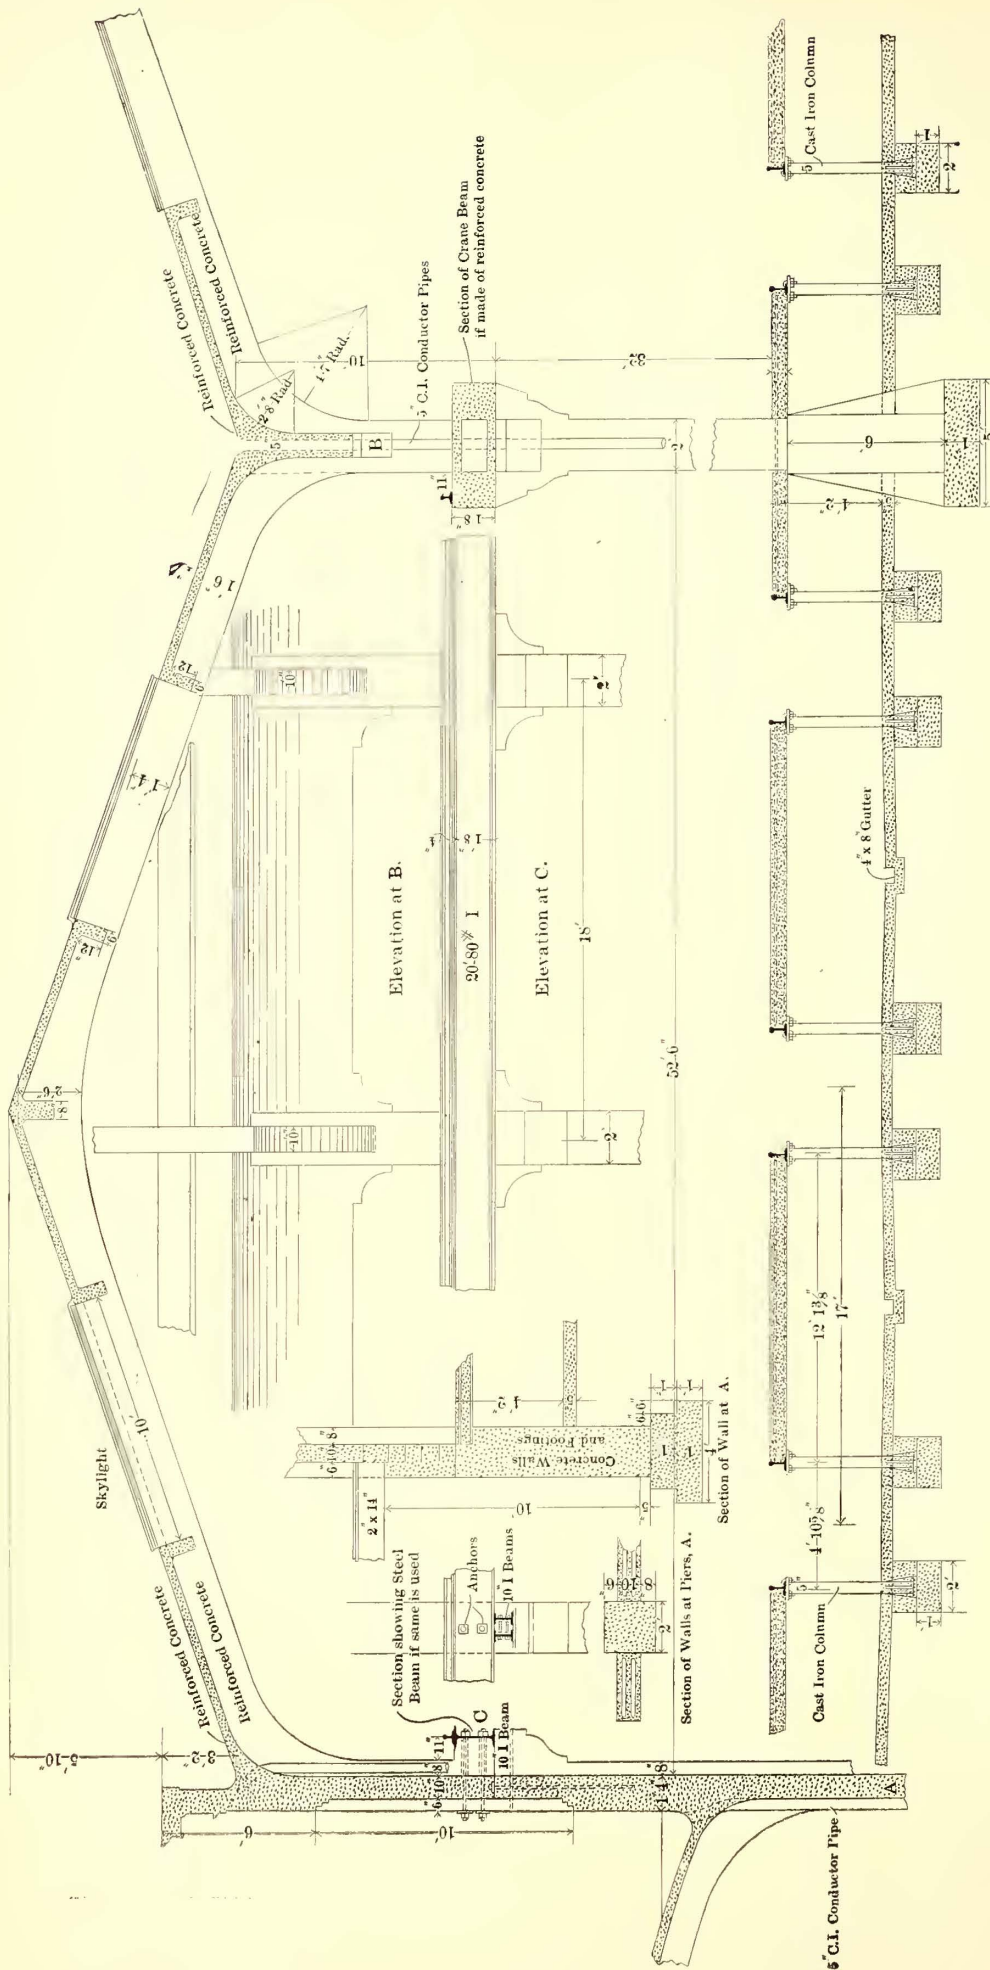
SECTIONS OF SNELLING AVENUE CAR HOUSE, TWIN CITY RAPID TRANSIT COMPANY
